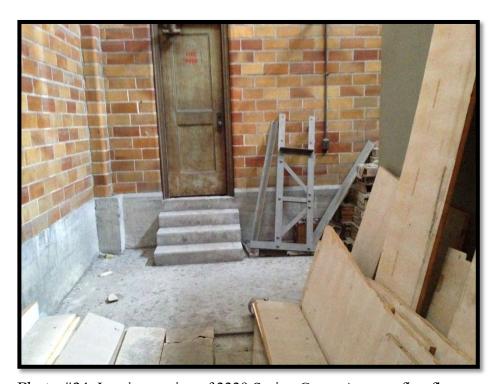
Interior portion of 2229 Spring Grove Avenue, first floor.
